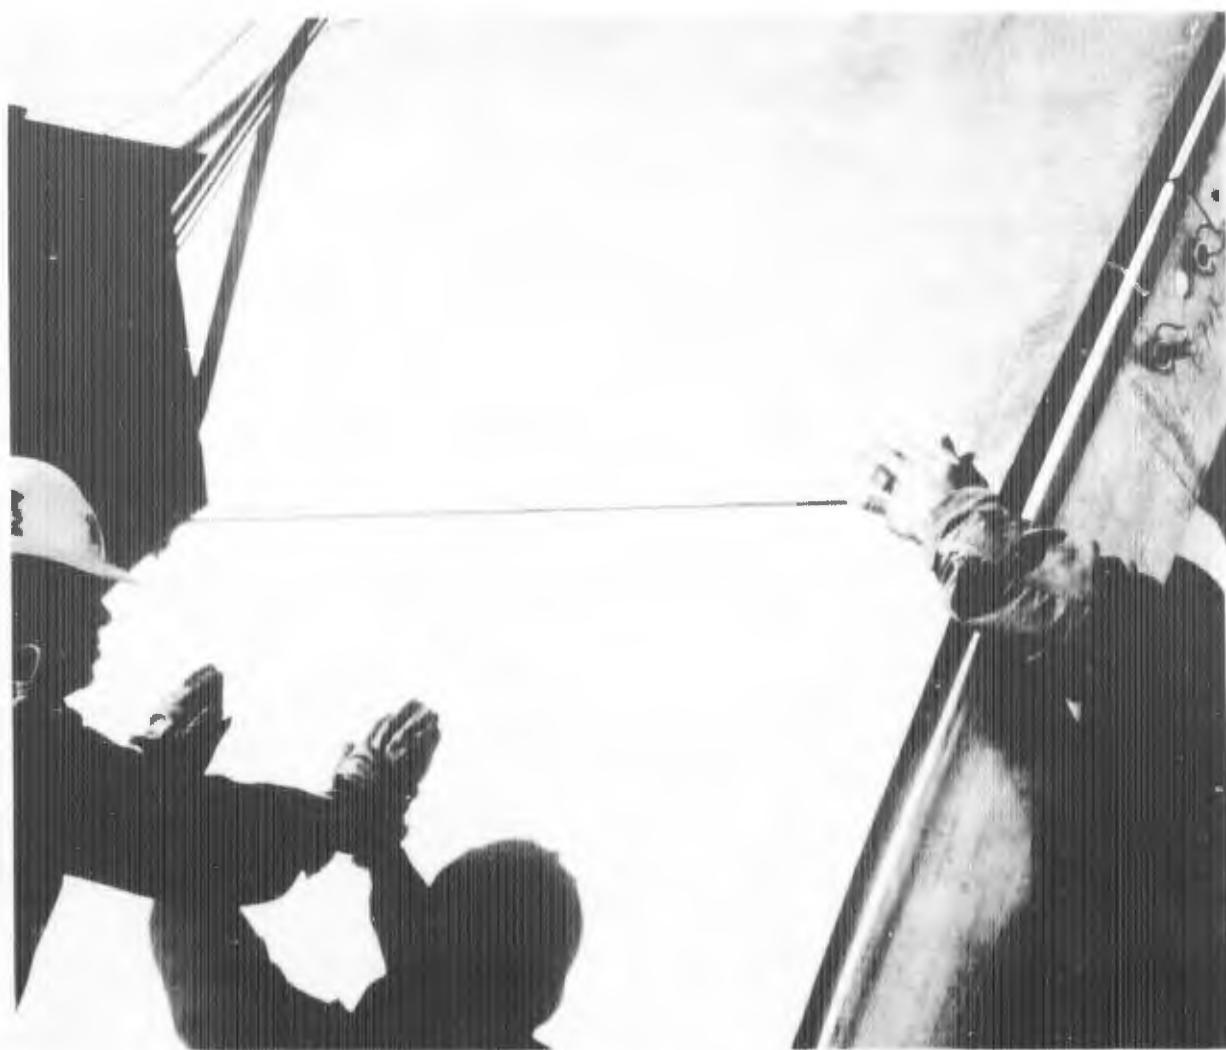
Pressure Being Applied to Panel Corners to Start on Arch Beam Track
